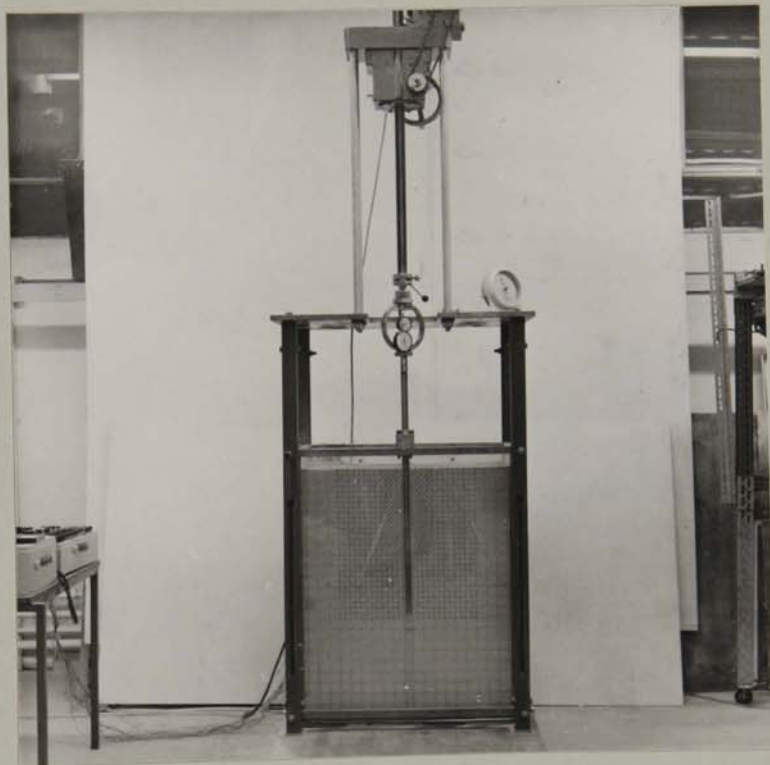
FRONT ELEVATION OF HALF - SECTION
